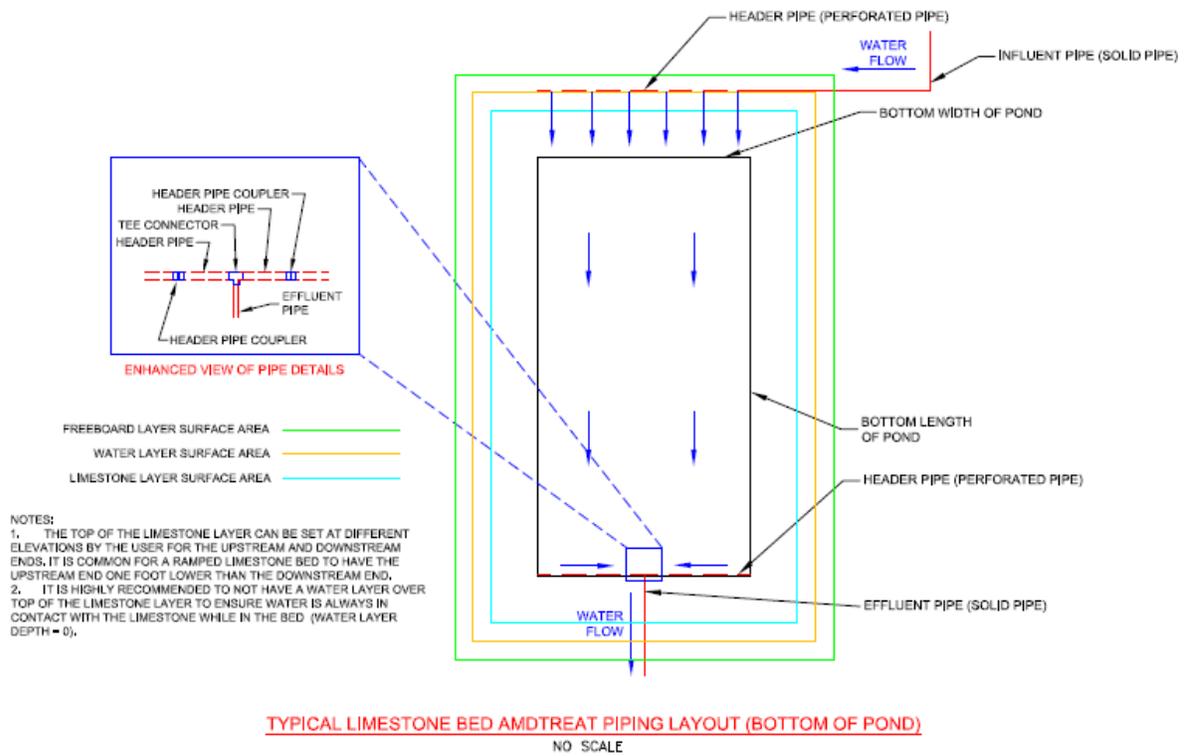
Plan View of the Limestone Bed (LB) to Illustrate Common Piping Layout and Components (Used in AMDTreat Piping Calculator) and the Layer Surface Areas
